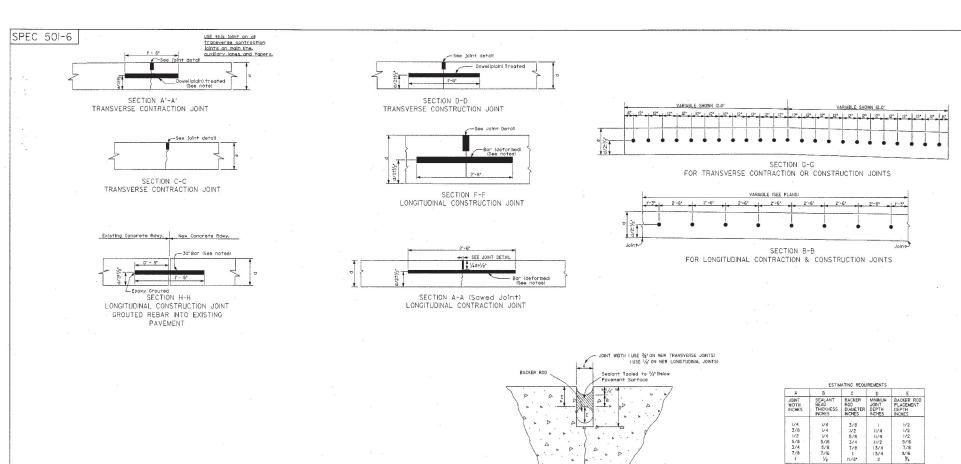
DETAIL OF CONSTRUCTION AND CONTRACTION JOINT DOWEL ASSEMBLY
